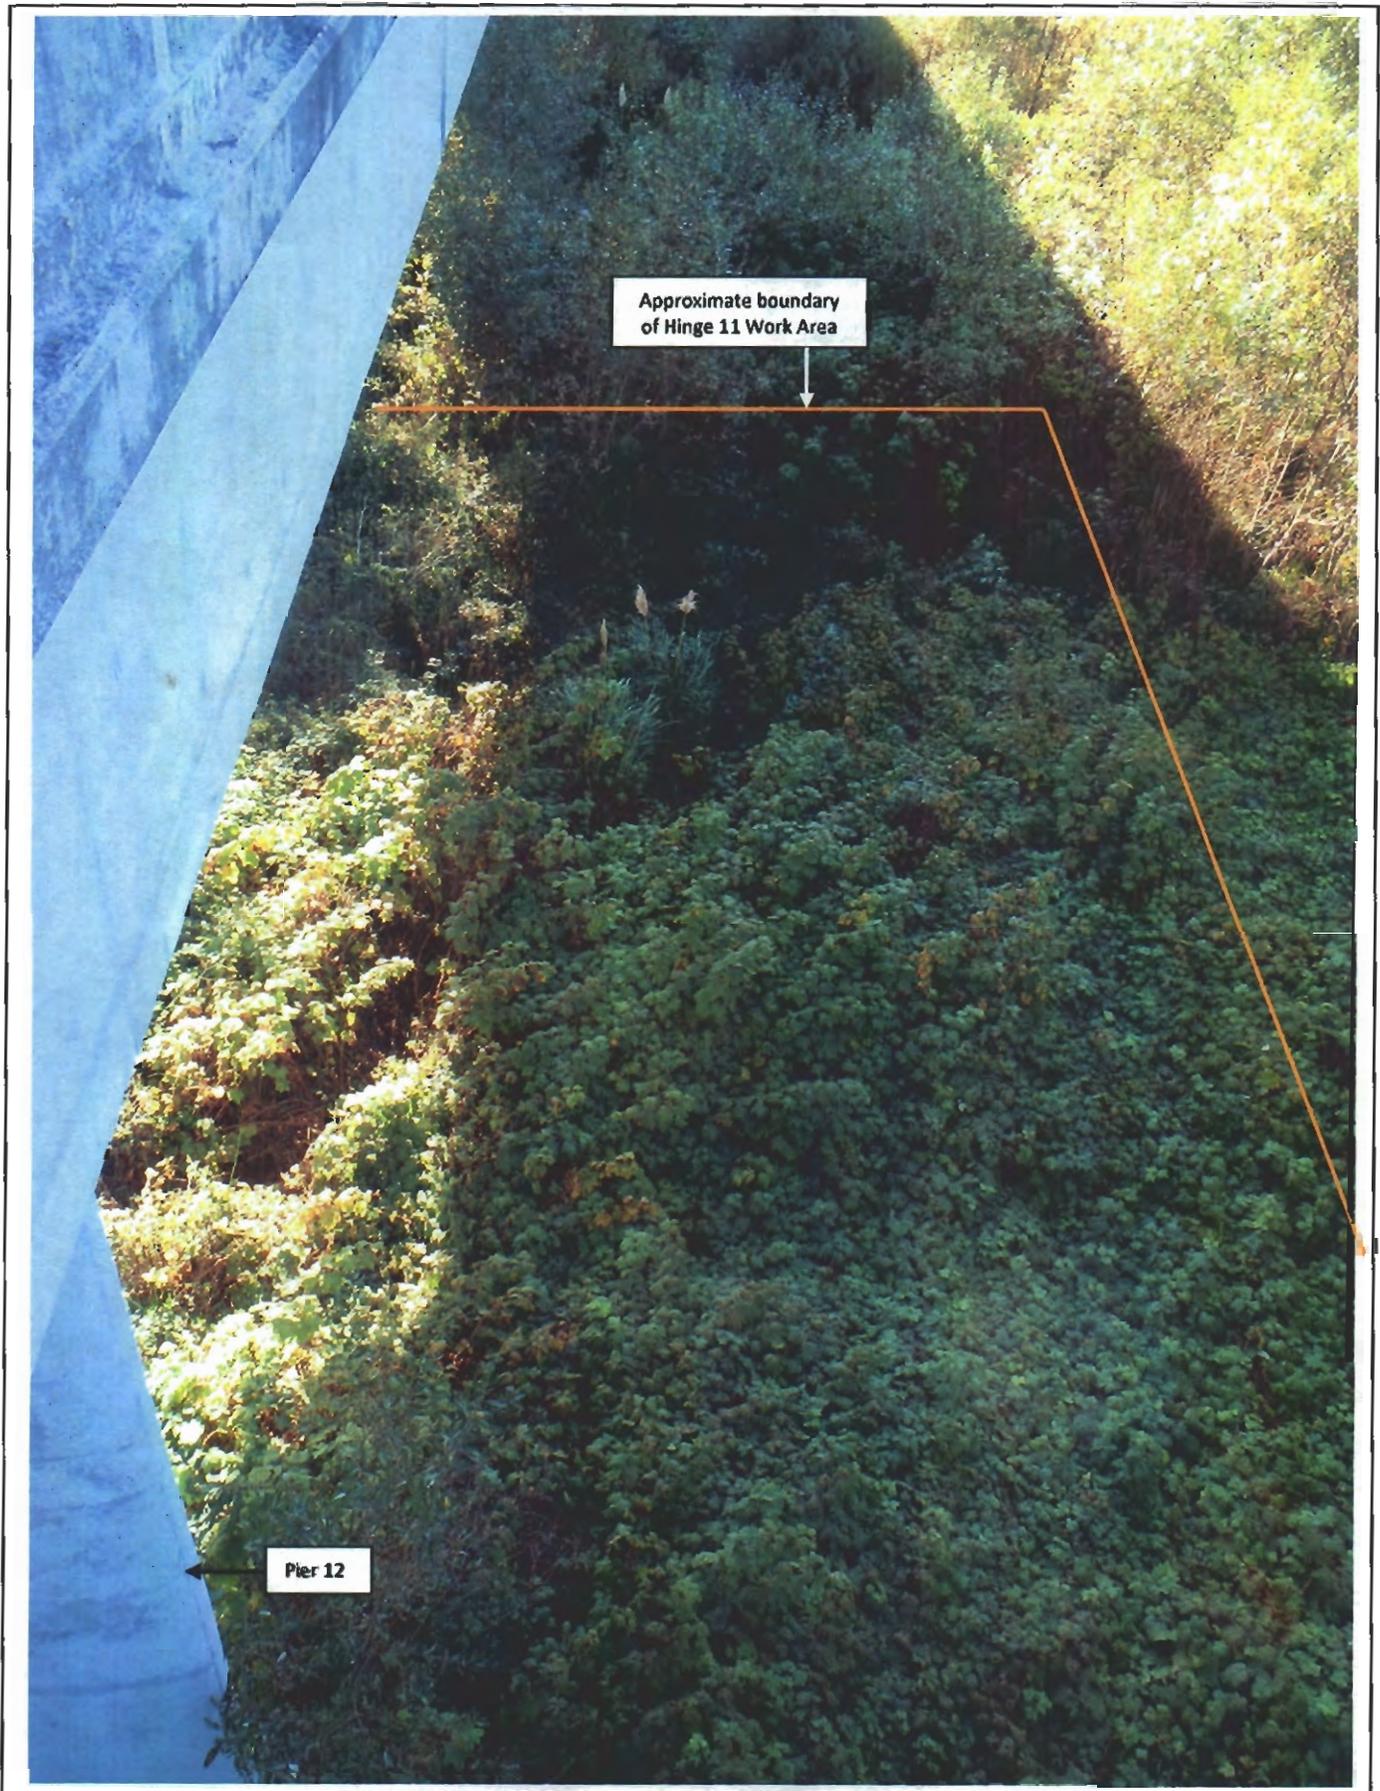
Hinge 11 Work Area: View From Deck Looking South (West Side of Bridge)
